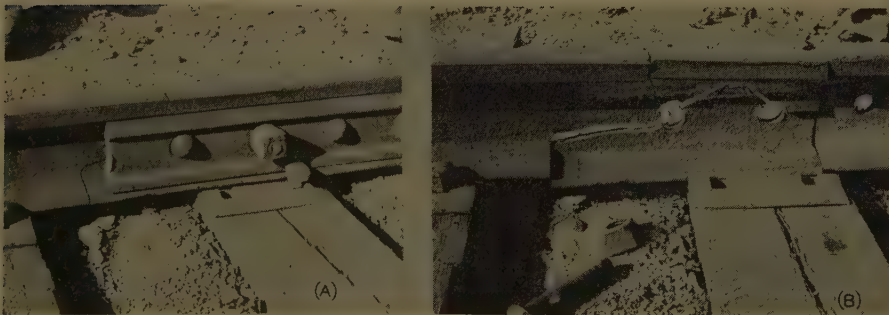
A—Bolt-hole breaks, which can progress in all directions. B—Same joint, angle bars removed
